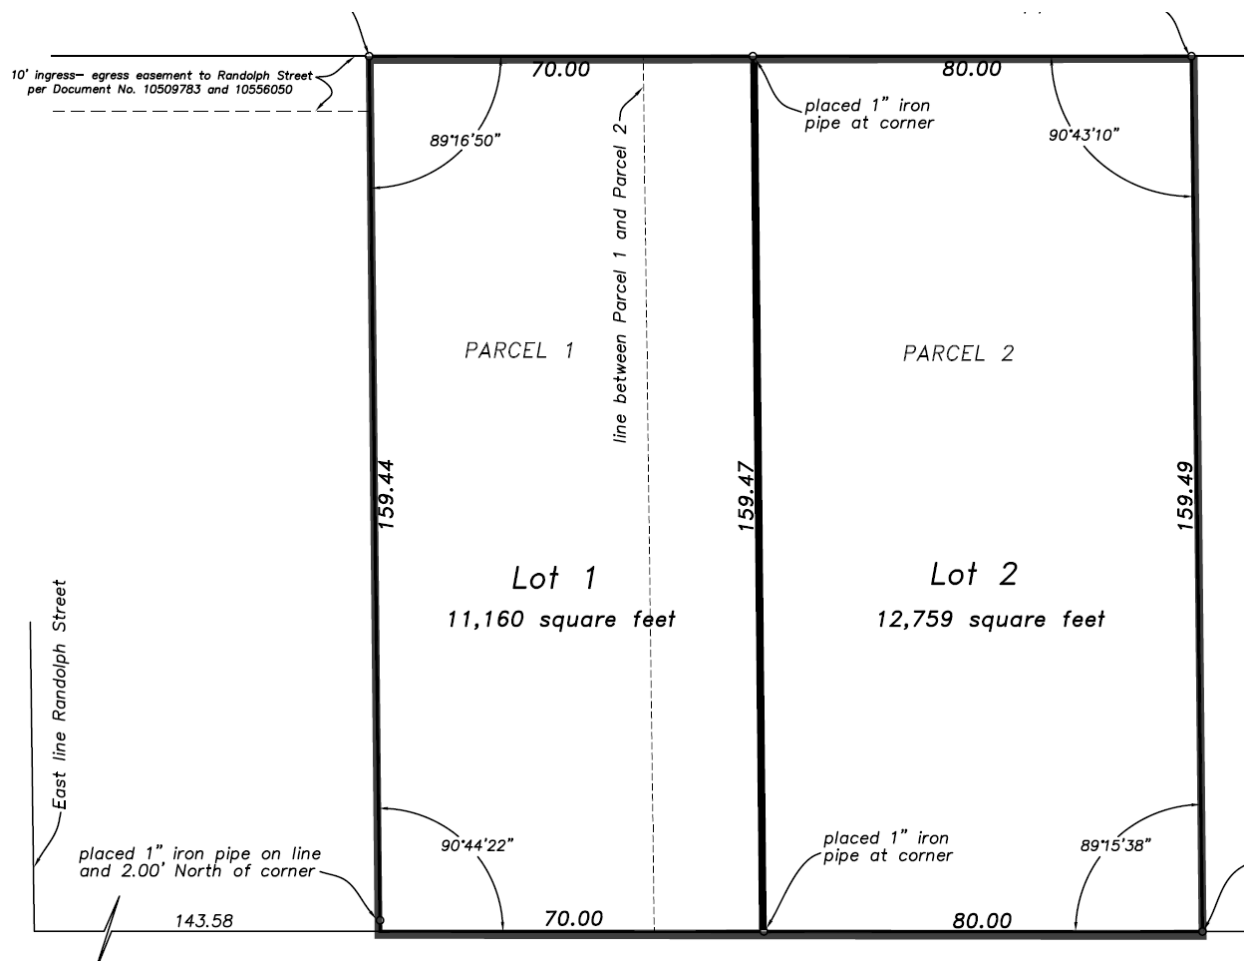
Excerpt of Proposed Scott Avenue Subdivision Plat
